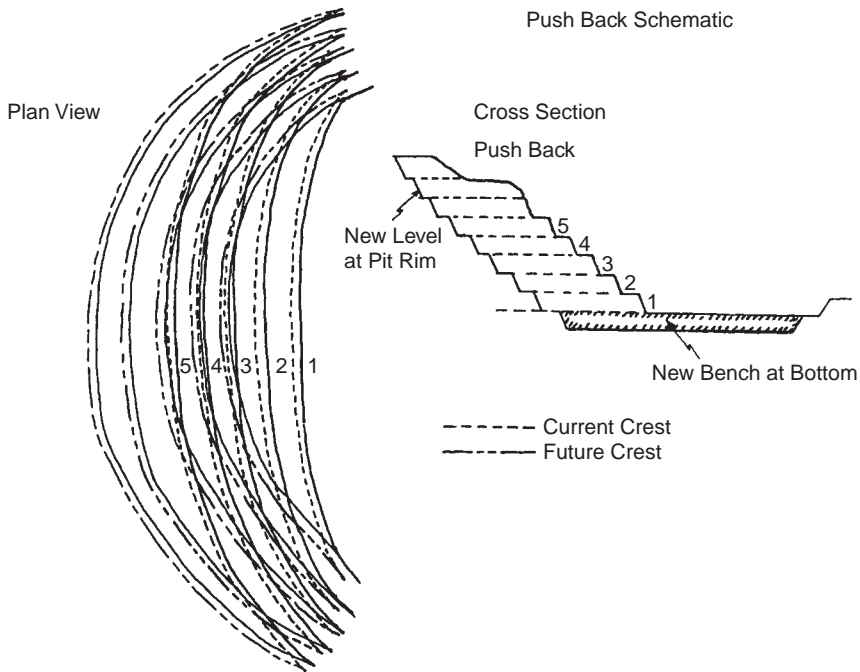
Push back schematic in plan and section views (Crawford, 1989a).
